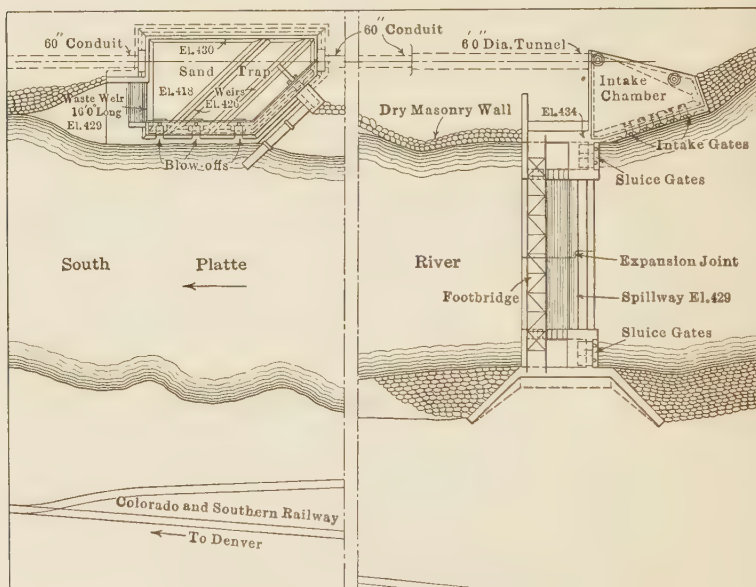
Plan of new head works for Denver Water Supply. (*Eng. Rec.*, Oct. 19, 1912.)
